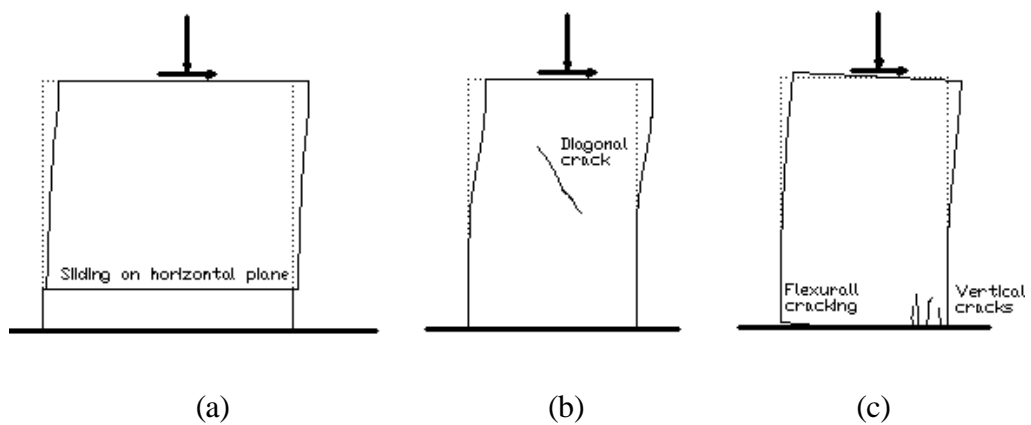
Sketches of Failure Patterns on masonry walls; (Calderini et al., 2009) (a) Sliding Shear (b) Diagonal Tension (c) Flexure
